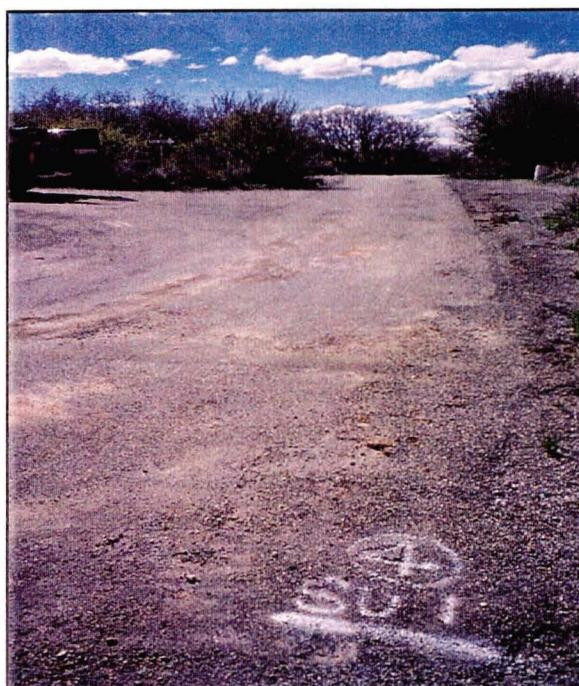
Section 4, Sample Unit 1 (MP 0.81)
